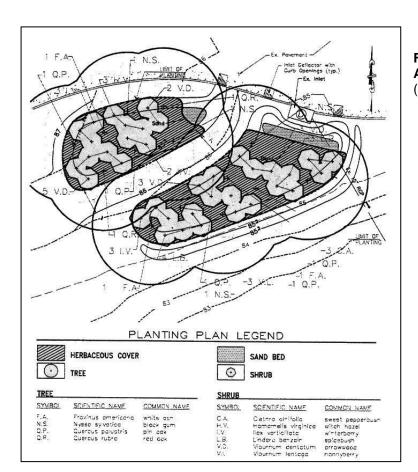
Sample Bioretention Area Planting Plan (Source: VDCR, 1999)
